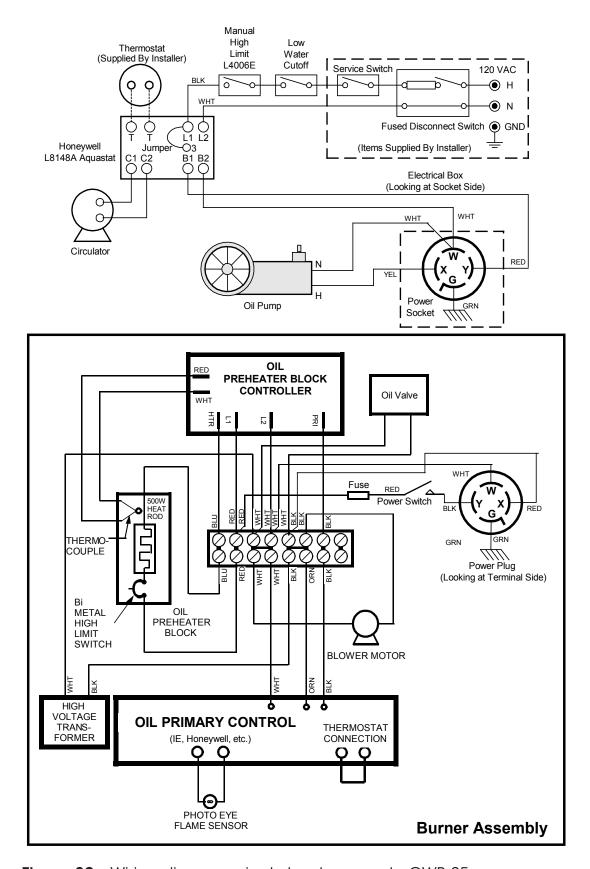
Wiring diagram, single heat zone only, OWB-25
